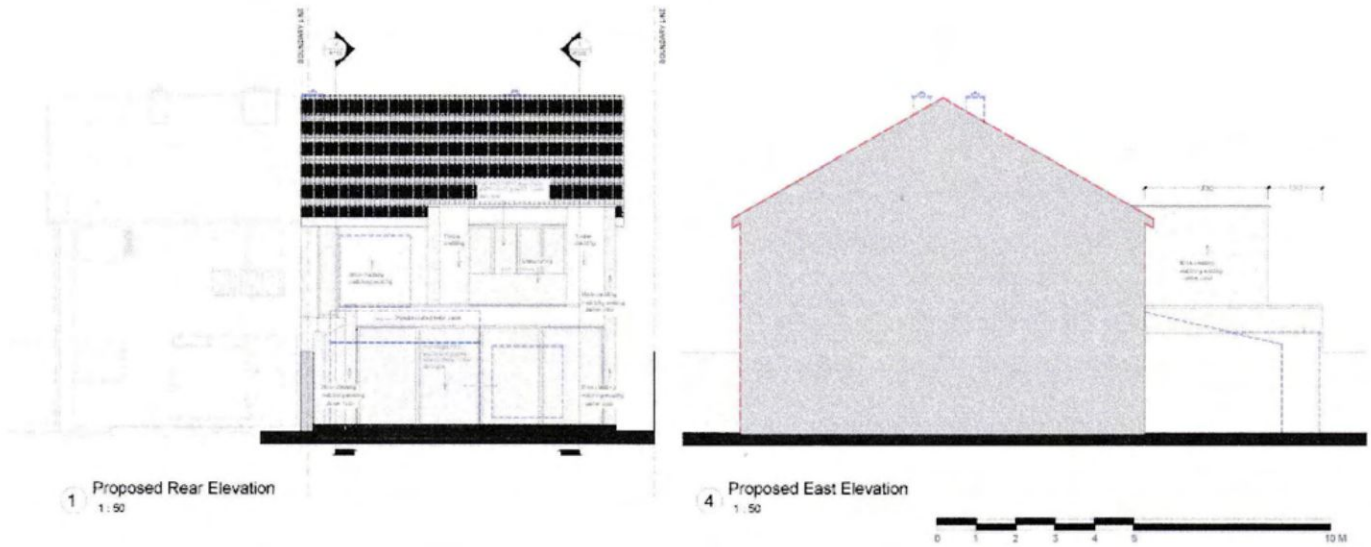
Proposed Rear Elevation to 94 Temple Sheen Road and Sectional Elevation through No92 looking west
